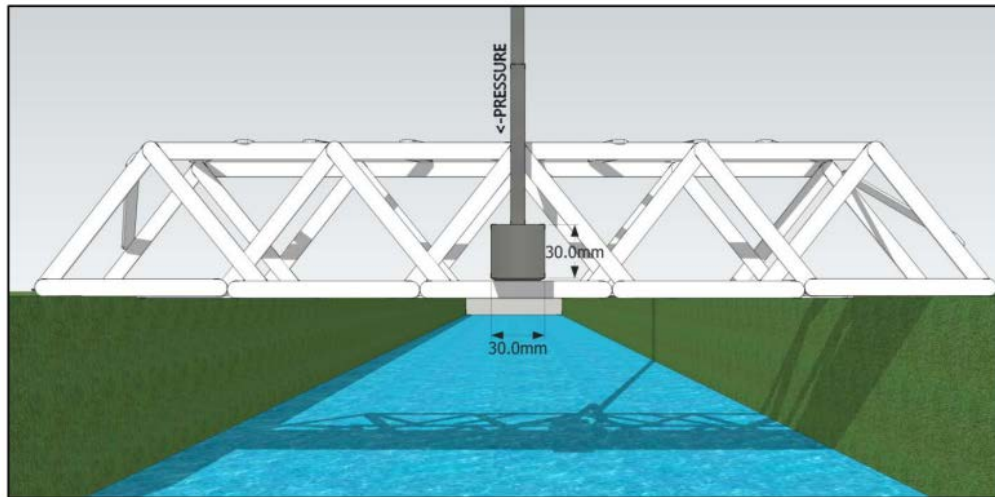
From APEGBC Northern Branch Popsicle Stick Bridge Building Competition
